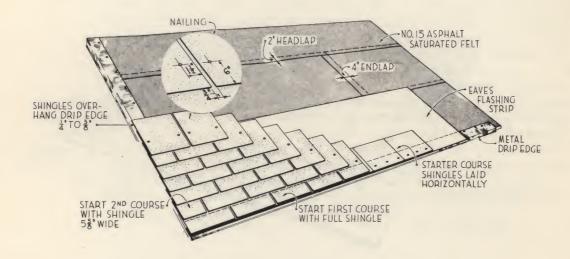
Giant individual shingles applied over a new wood deck by The American Method.
